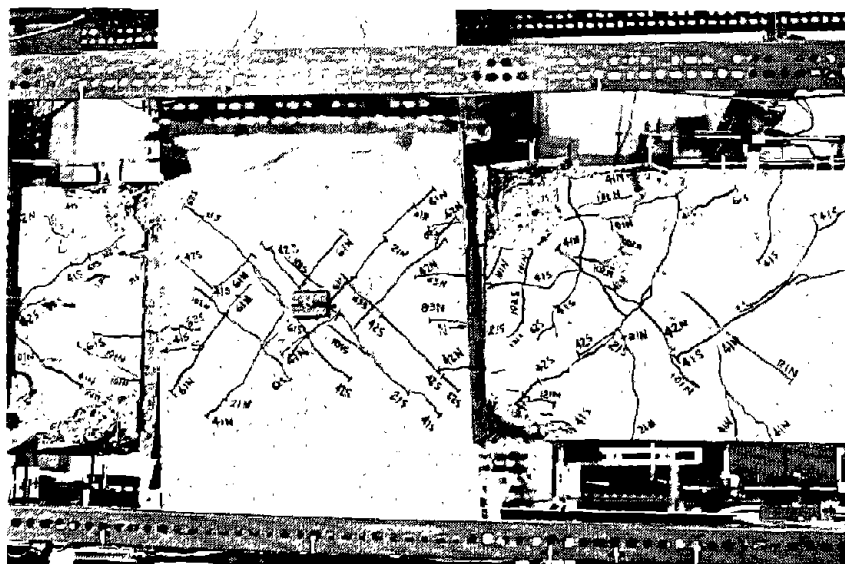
Specimen C-P-Z4 at failure - $12 \Delta_y$.
